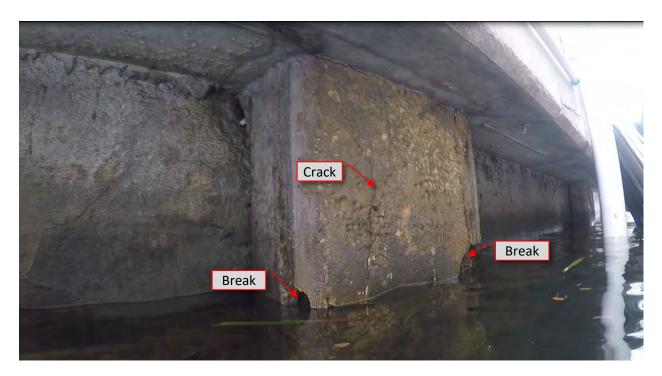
P30. STA 5+00. Cracks/spalls at both flanges at pile and loss of concrete.
